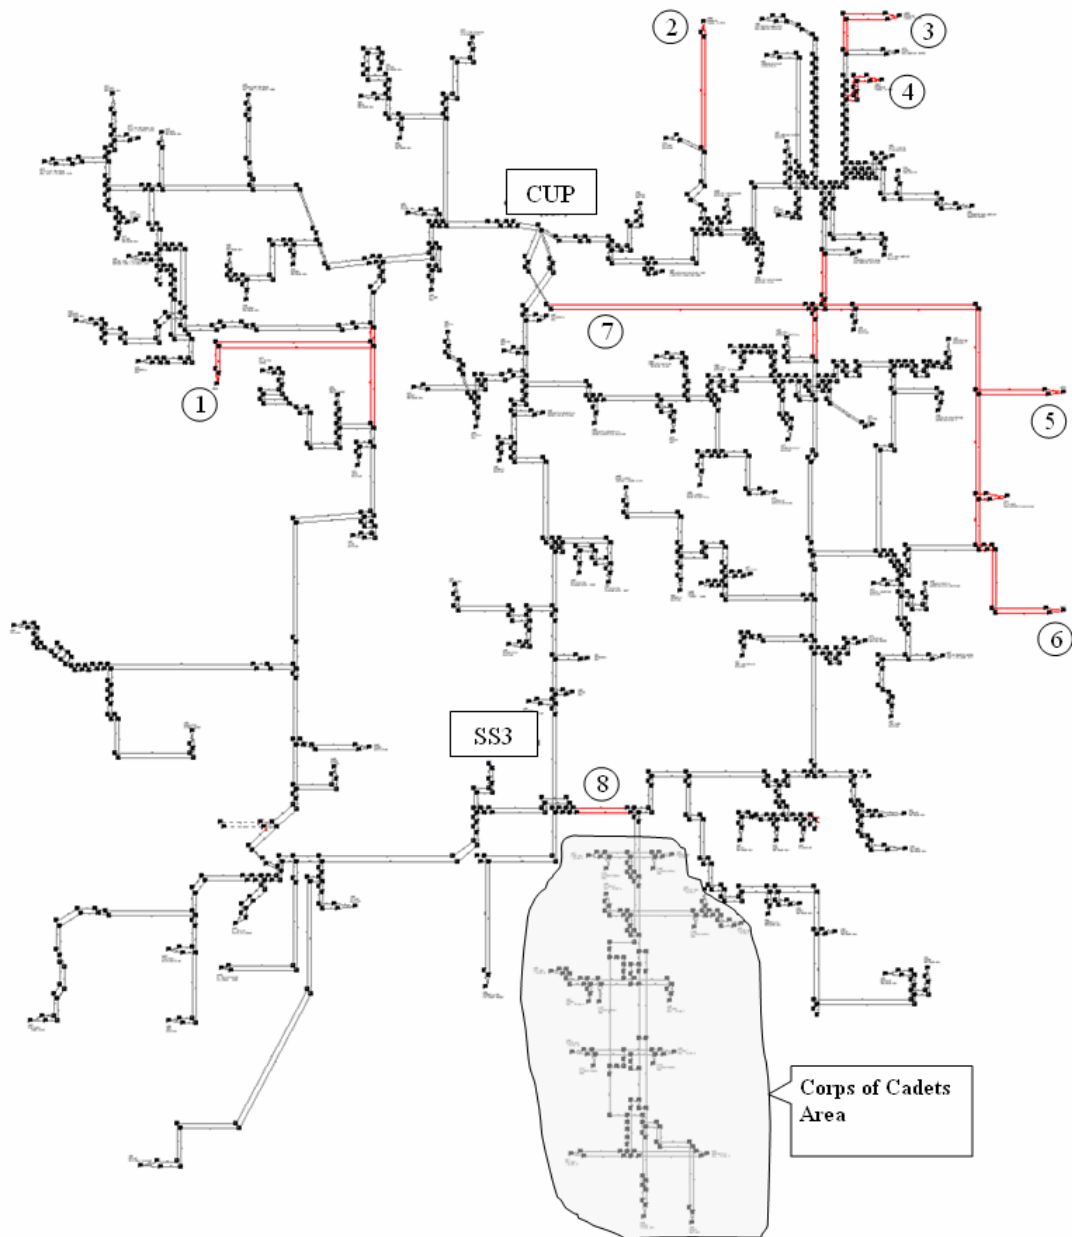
Model Layout of planned TAMU MC DCS Hydraulic System
